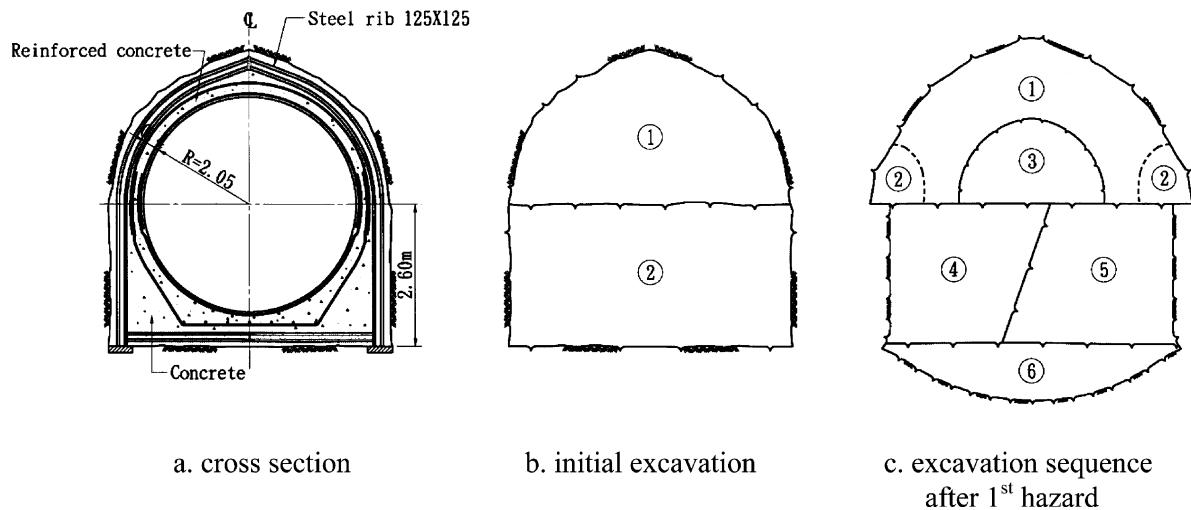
Cross-section and excavation sequence of the pressure tunnel of Wushantou Reservoir.
